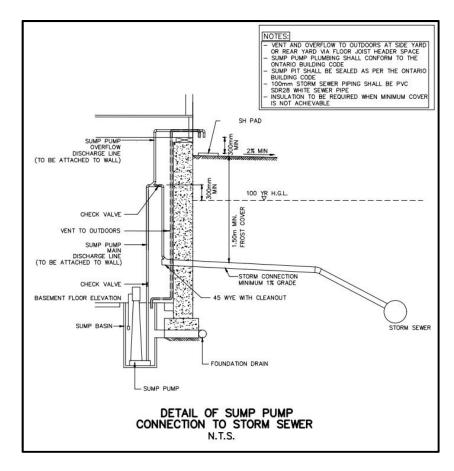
Potential Detail of Sump Pump Connection to Storm Sewer (DSEL, 2017)
